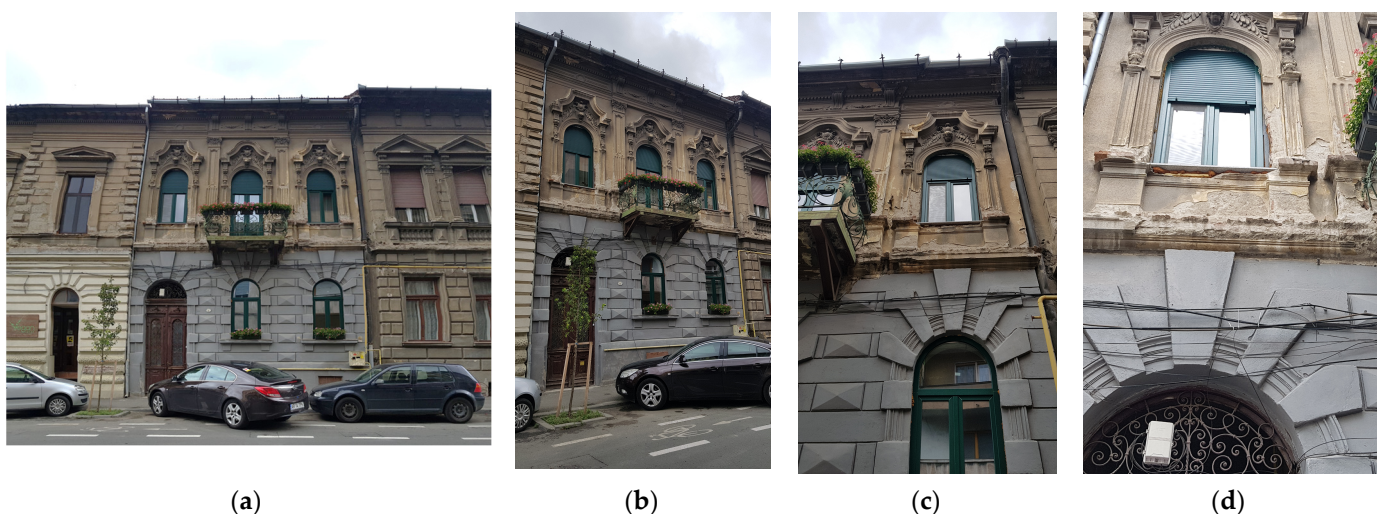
The analysed building: (a,b) street façade and context; (c) façade details and ornaments; (d) state of conservation of the façade.
